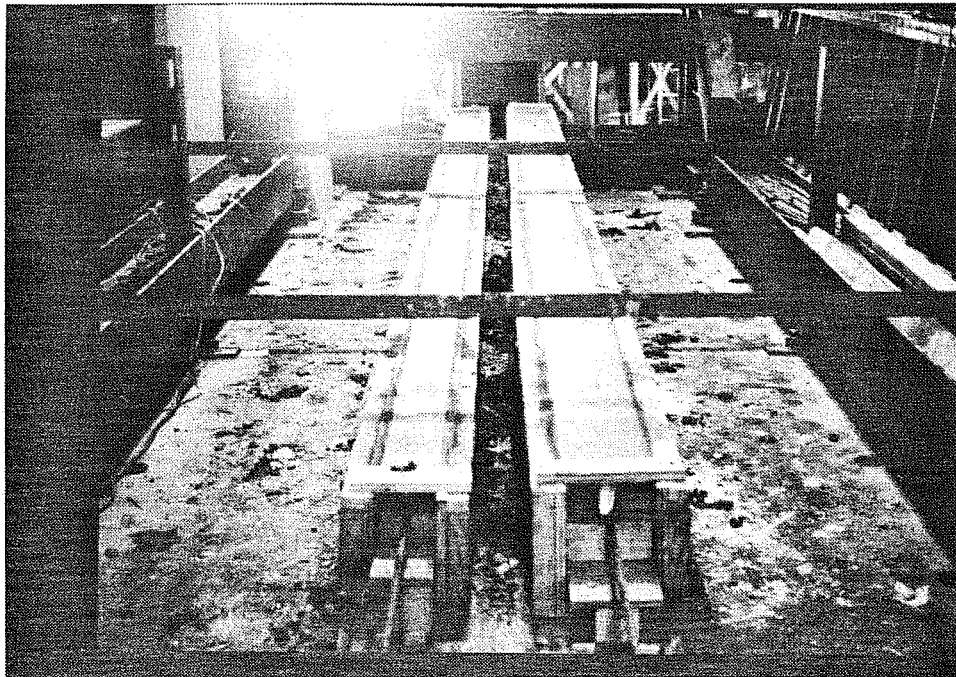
Photograph of specimens in prestressing bed after placement of concrete.
